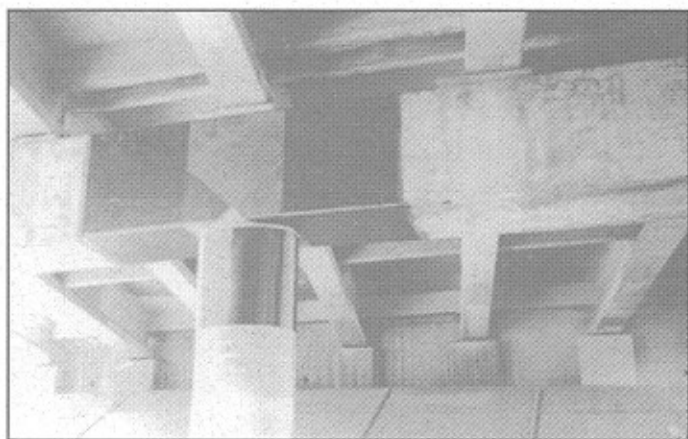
CFRP Retrofit of Beam-Column Joint at Highland Drive Bridge.
